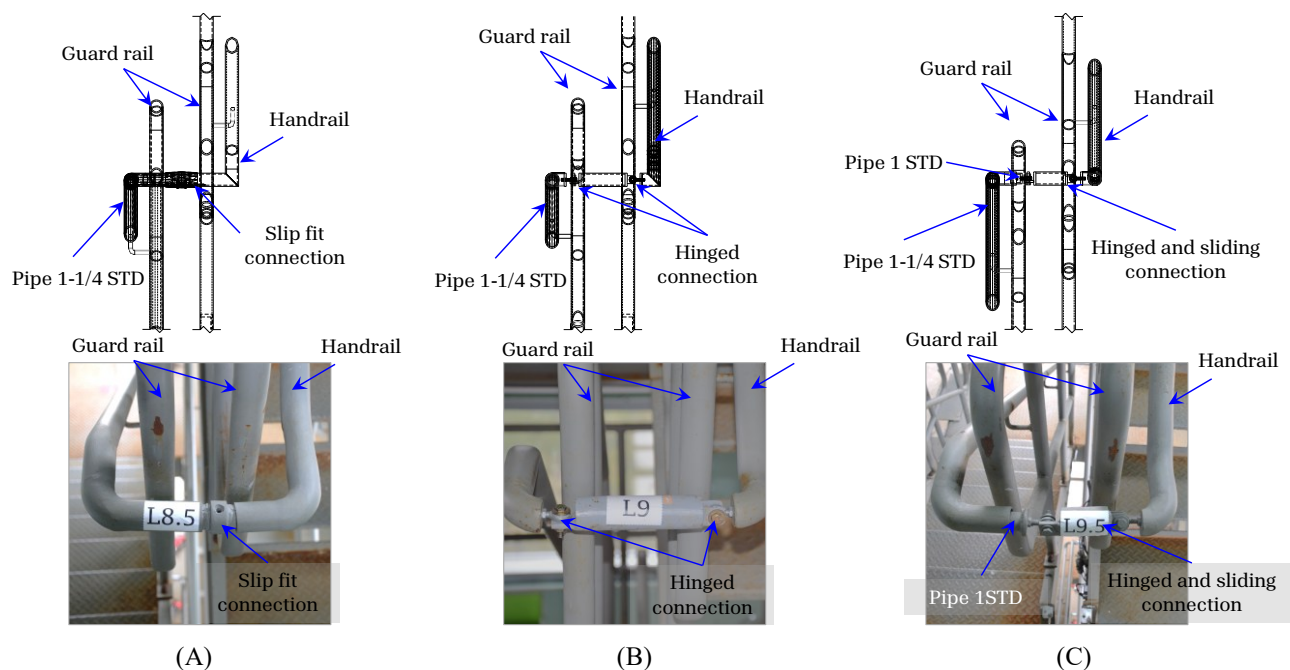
Handrail connection details (A) slip-fit connection, (B) hinged connection, and (C) hinged and sliding connection.
